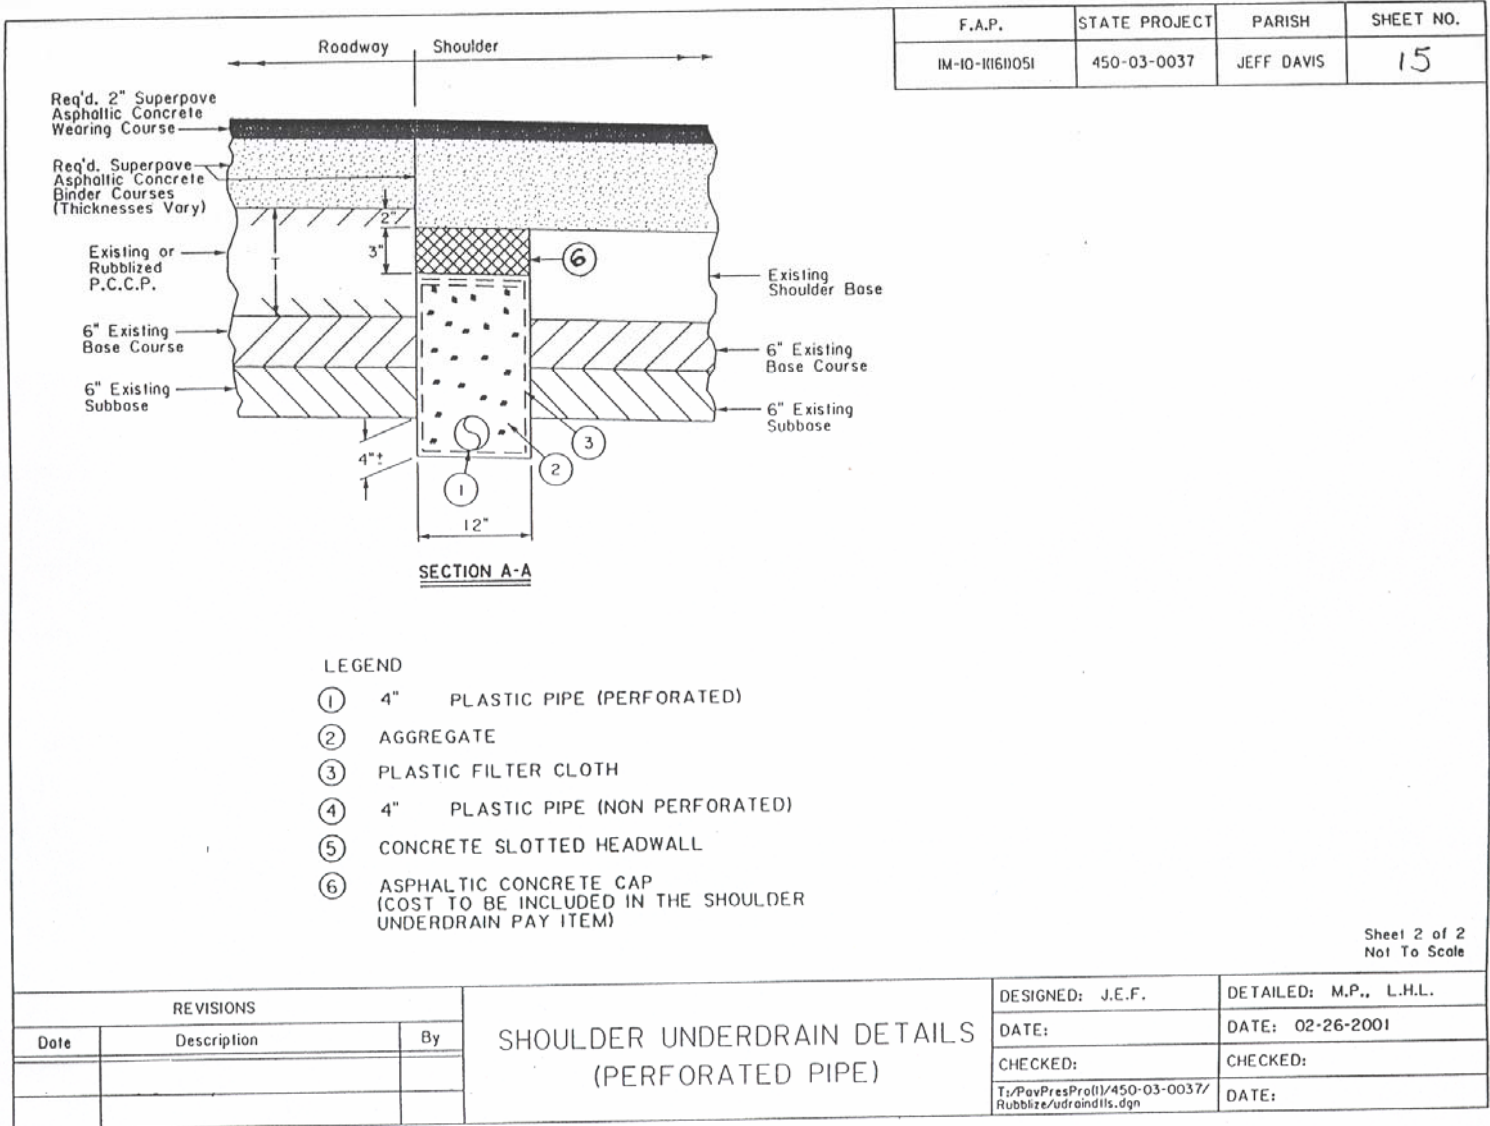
Details of Underdrain System Used by LaDOT on Rubblization Projects.
